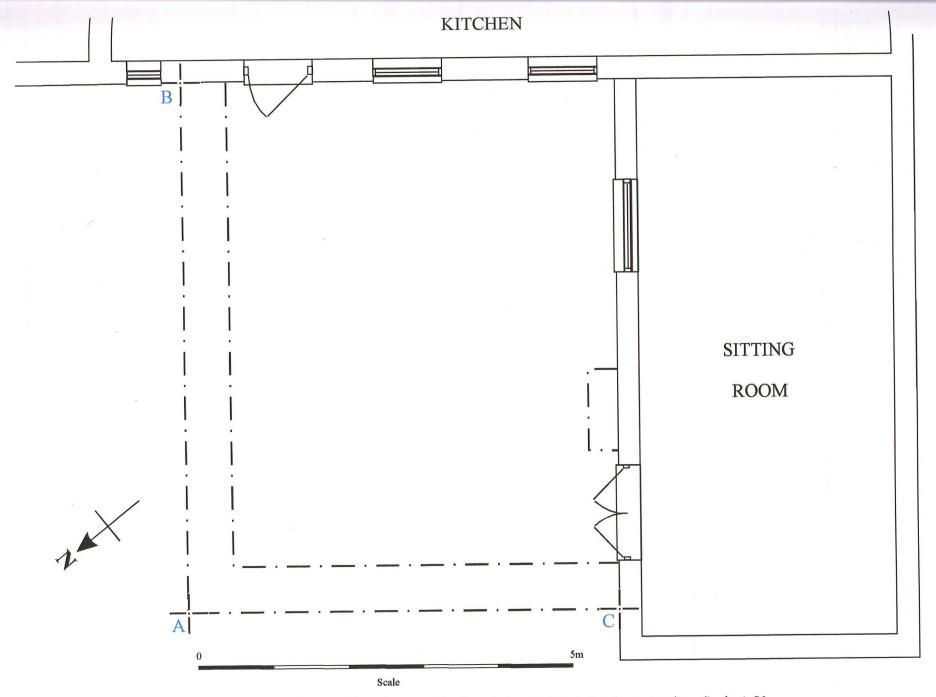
Plan showing the foundation trenches for the extension. Scale 1:50
